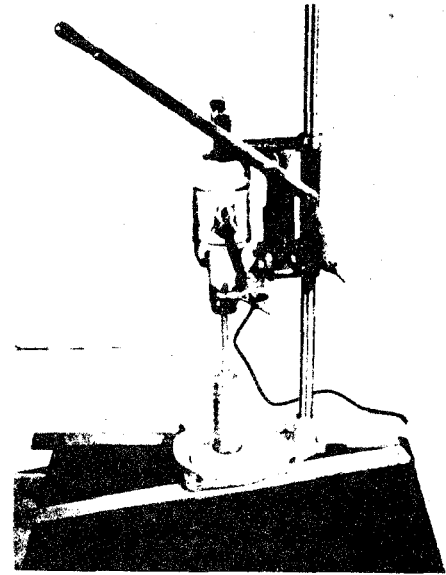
CORE DRILL USED TO CUT THROUGH OVERLAY PRIOR TO TESTING.
